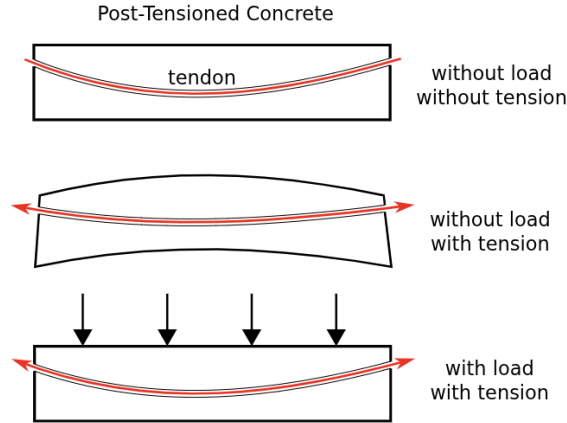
Simplified demonstration of a post-tensioned concrete beam. [4]
